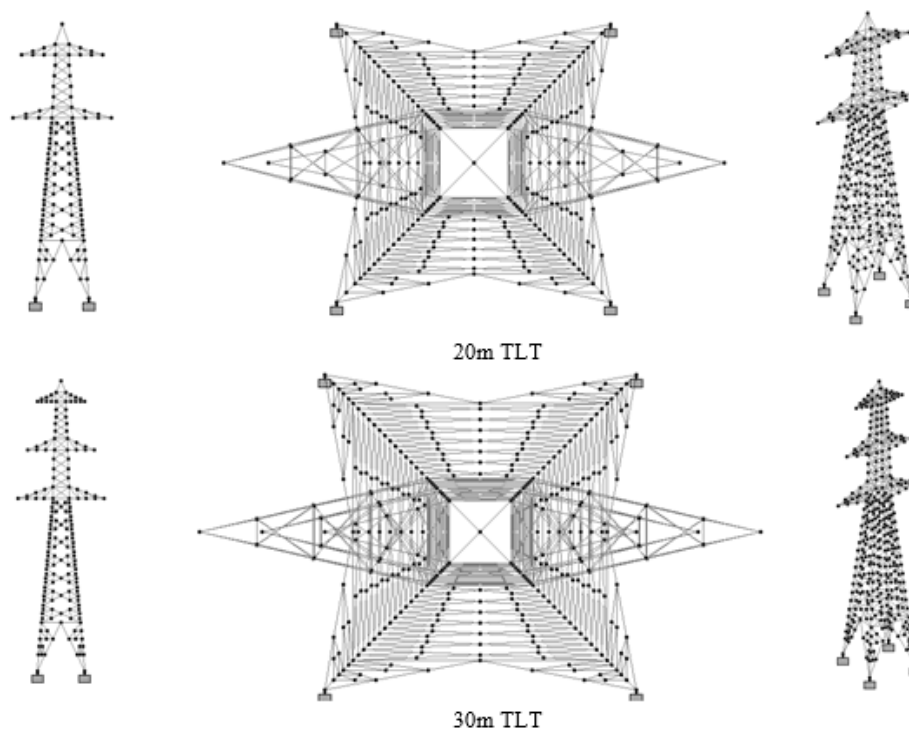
Bird eye view, elevation and plan of 20m and 30m TLTs.
